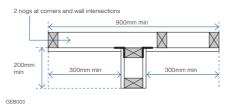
CORNER INTERSECTION (GIBFIX® FRAMING SYSTEM)
